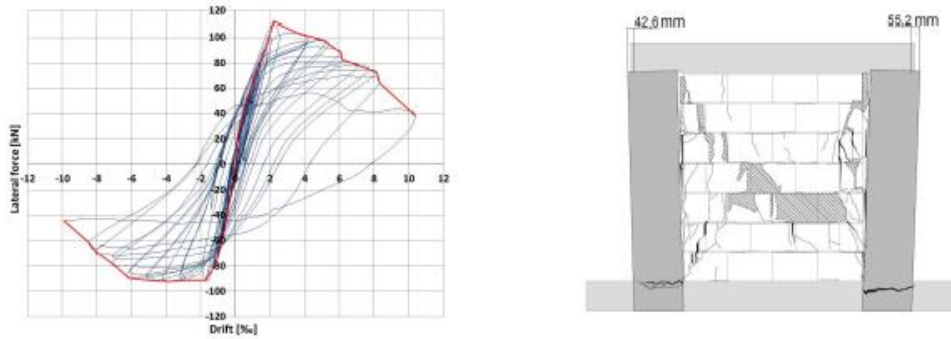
Hysteresis loop recorded during testing the WRU specimen (left); cracking pattern at the end of the WRU specimen testing (right). Legend: hatched areas show falling parts of masonry and cracks are reported with dashes whose thickness represents the cracks opening. By: Devaux.
